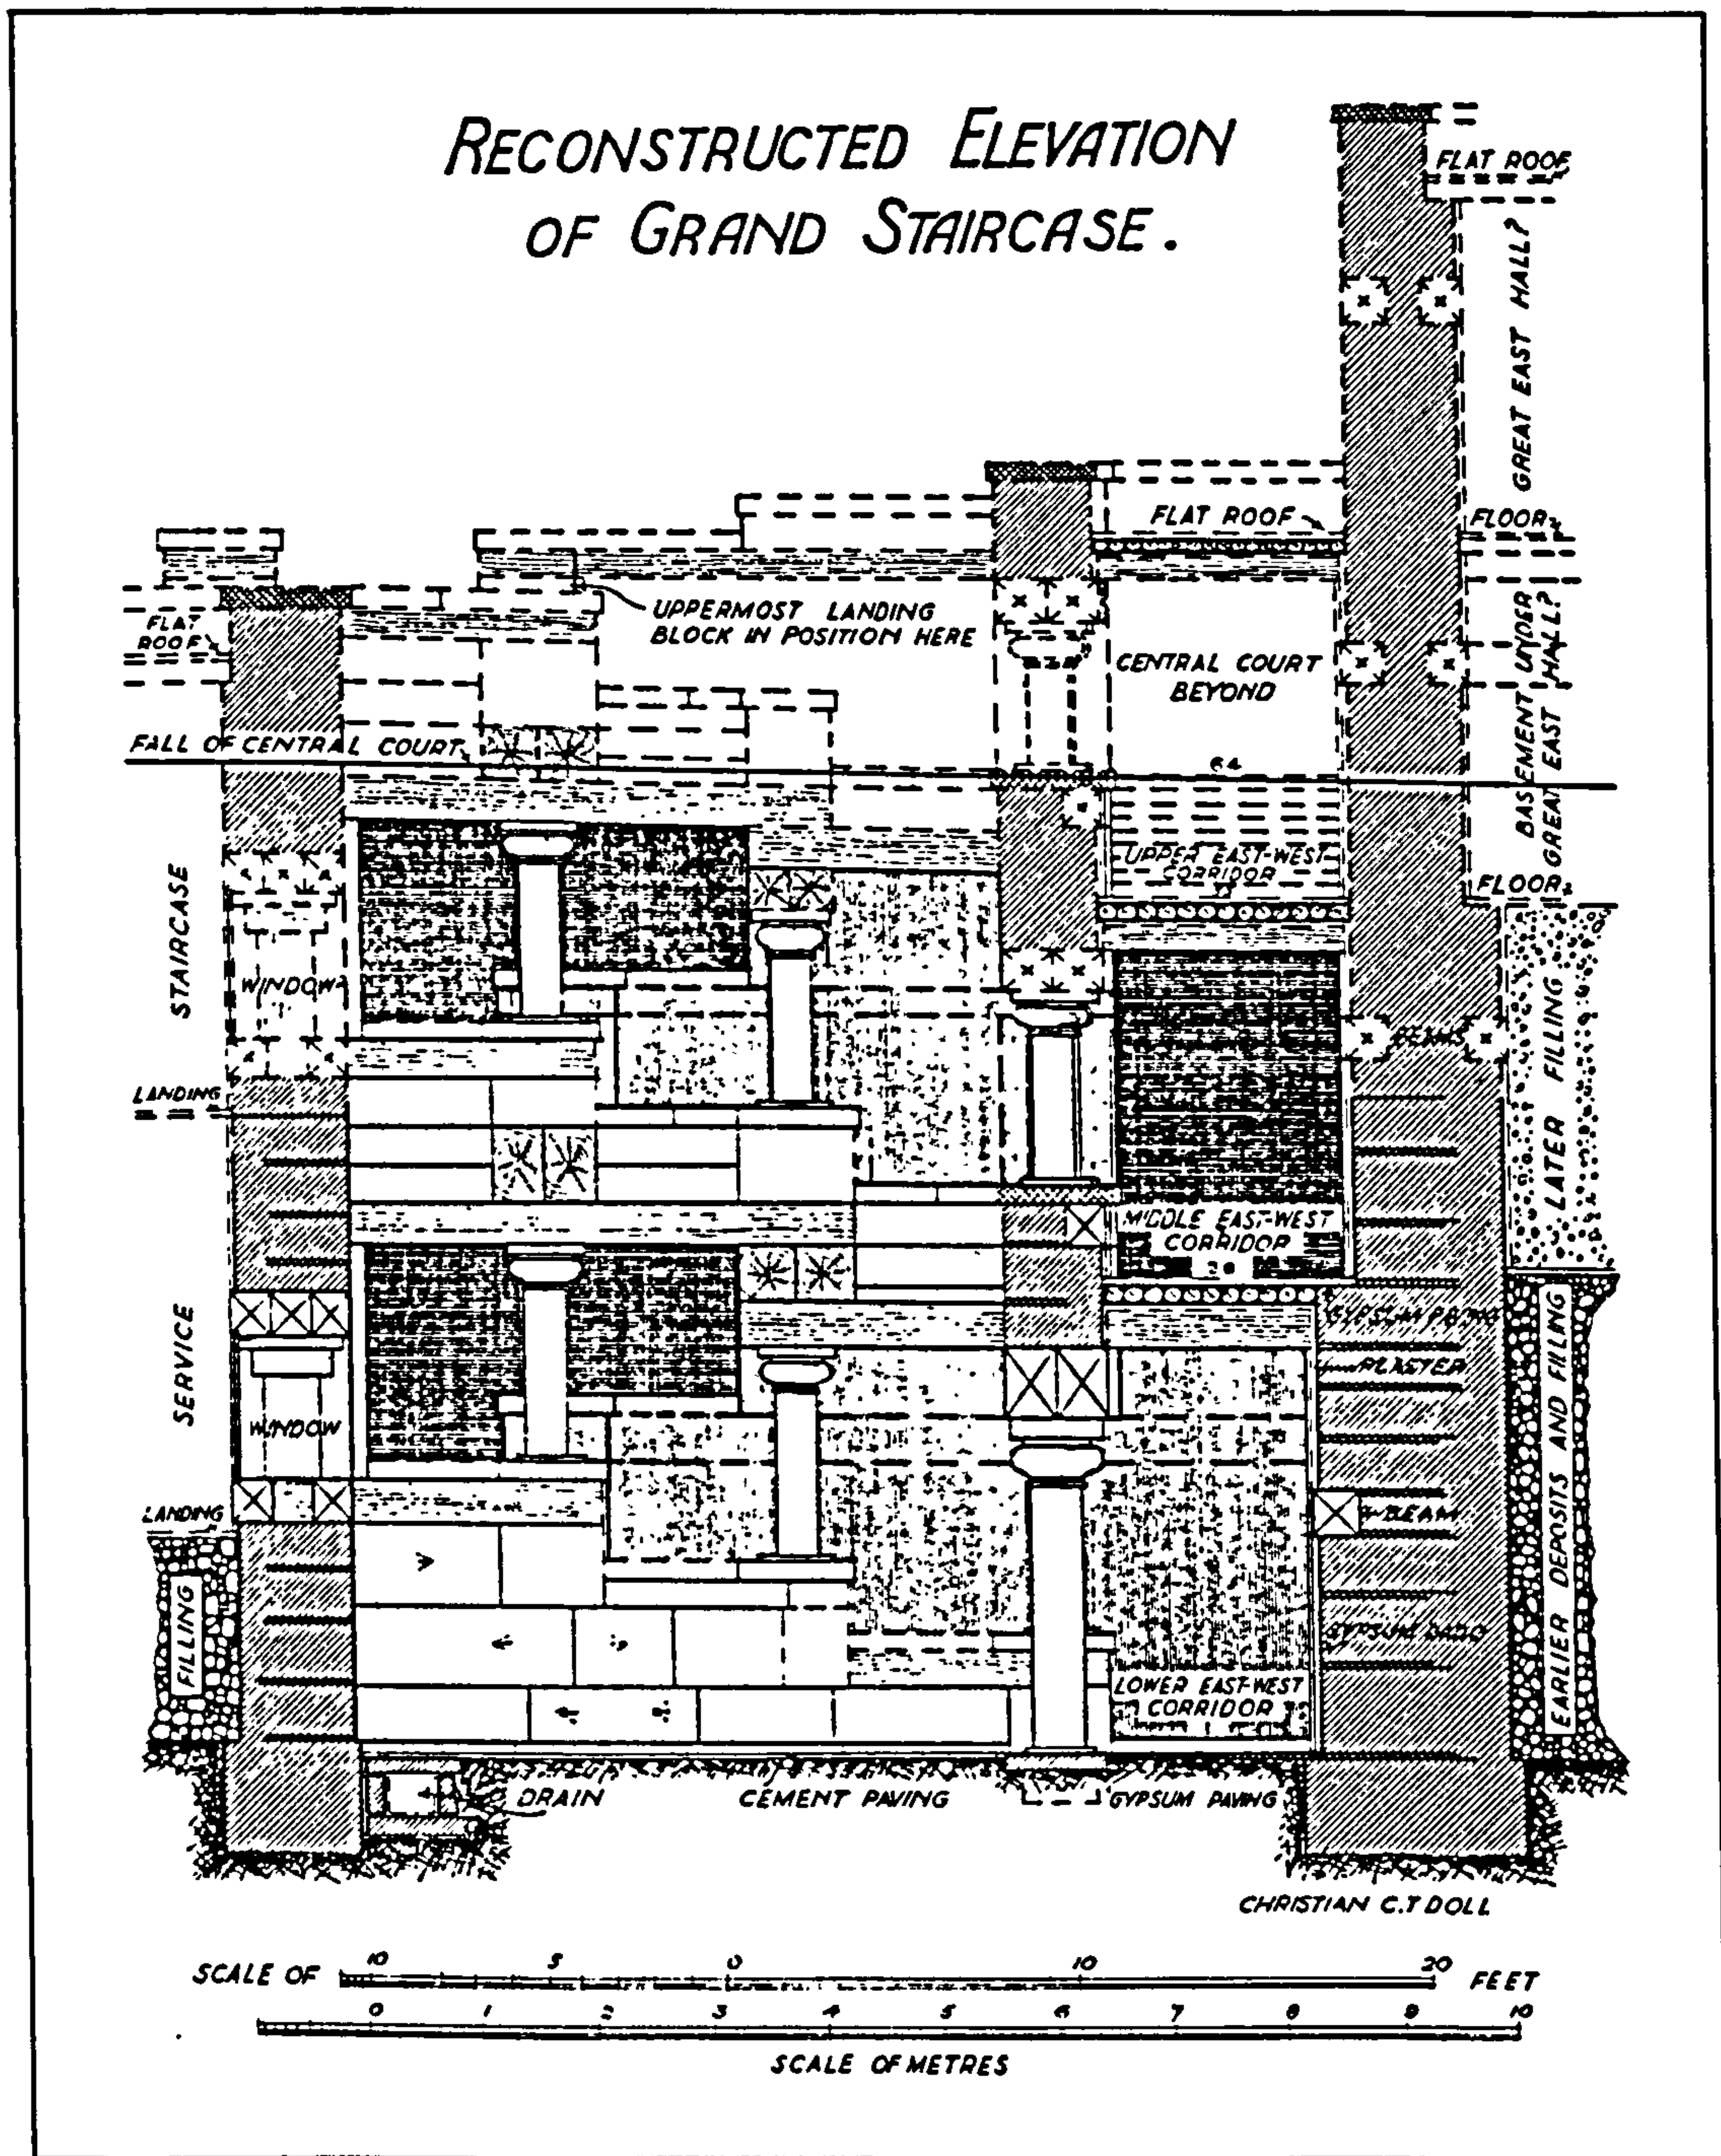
Reconstructed elevation of Grand Staircase (G/S 2). Drawing by Christian Doll.
